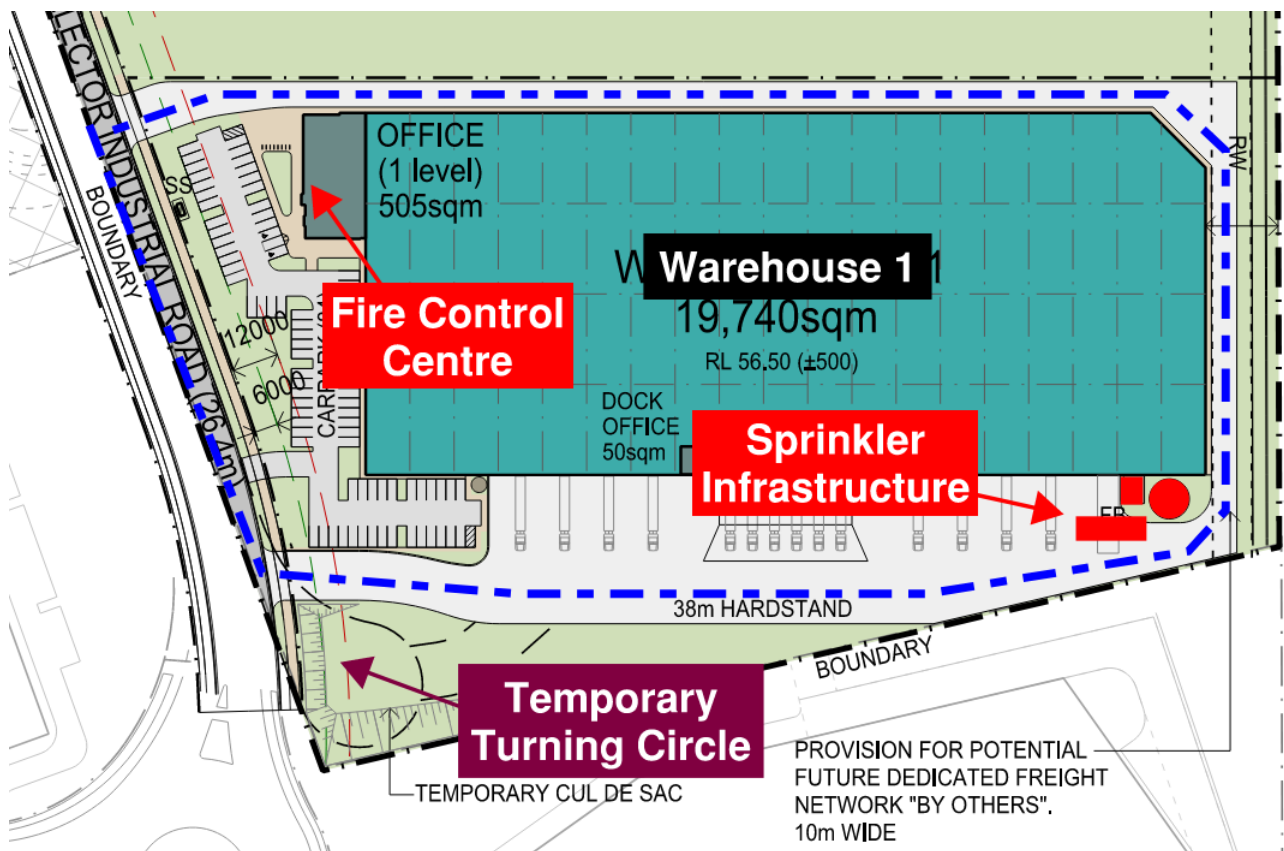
Fire Brigade Access and Site Facilities – Warehouse 1
